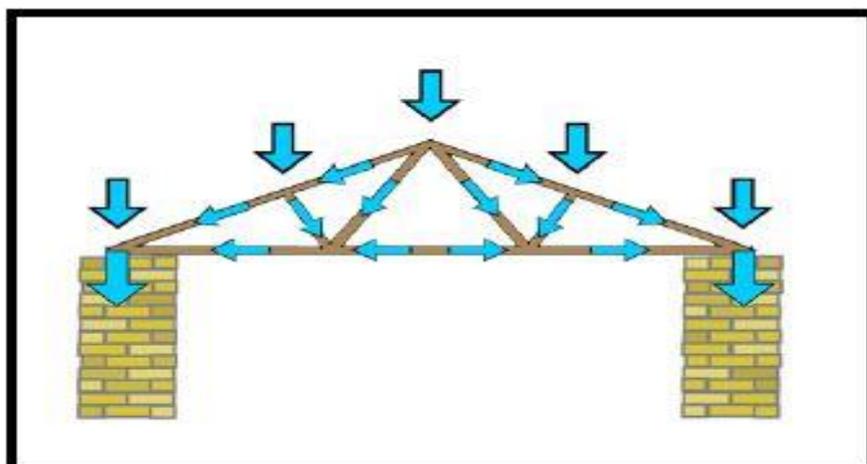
Distribution of load over a truss bridge^[13] Source- Jasim(2016)
